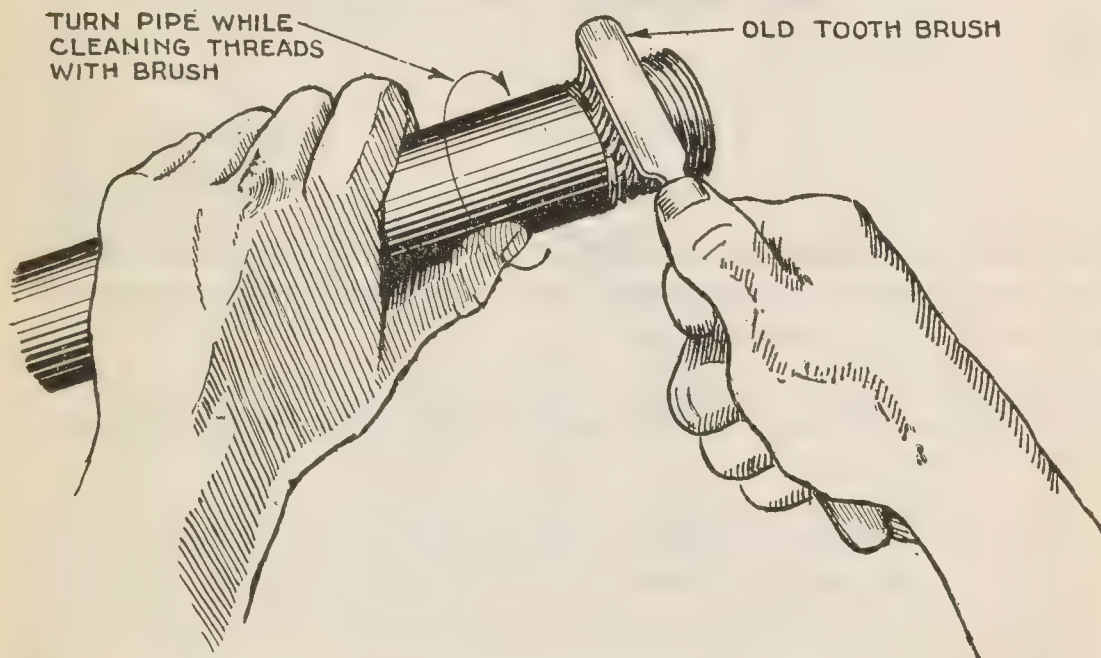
,006.—Method of cleaning *male* threads with old tooth brush.
